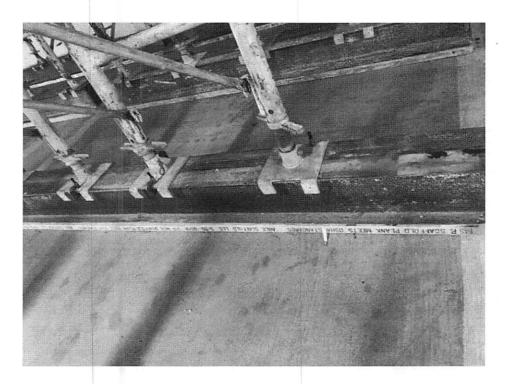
Spreader beam and post attachment at the shoring towers.
